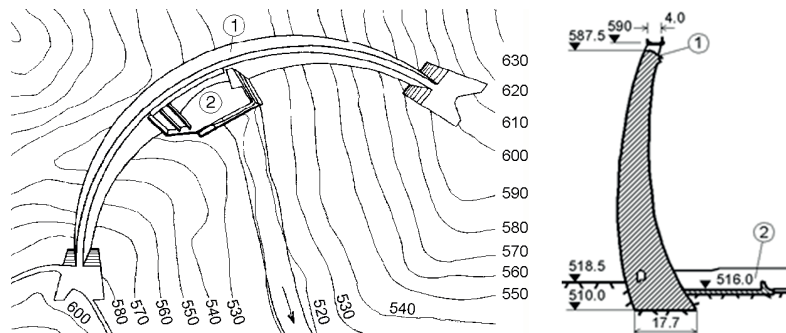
Layout and typical cross section of the arch dam 'Glaznja'
